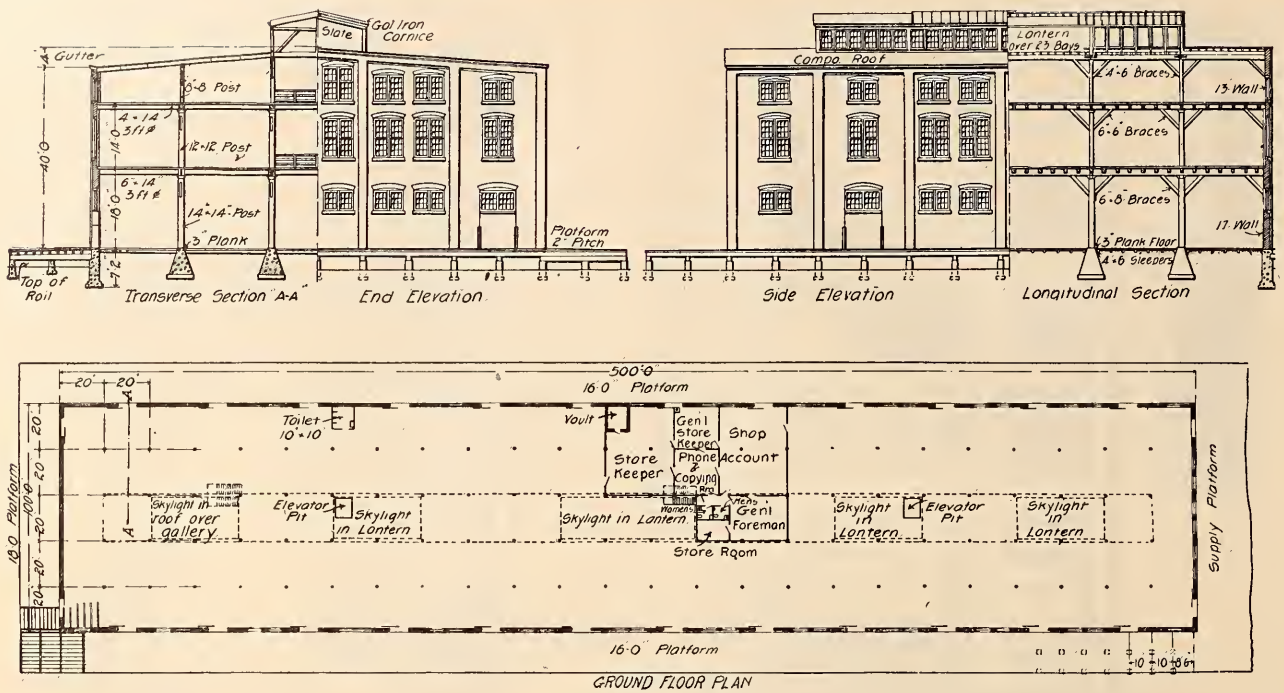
PLAN AND ELEVATIONS OF THE STORE HOUSE OF THE NEW SHOPS OF THE ROCK ISLAND SYSTEM AT EAST MOLINE, ILL.
